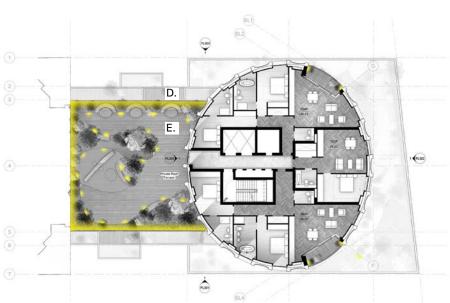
Fourth Floor Plan indicating external lighting elements
